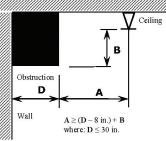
Sprinkler positioning Source: NFPA 13D, 2016 Edition, Figure 8.2.5.3.3(a), Positioning of sprinkler to avoid obstruction against walls (i.e., pendent sprinkler with respect to a soffit)
